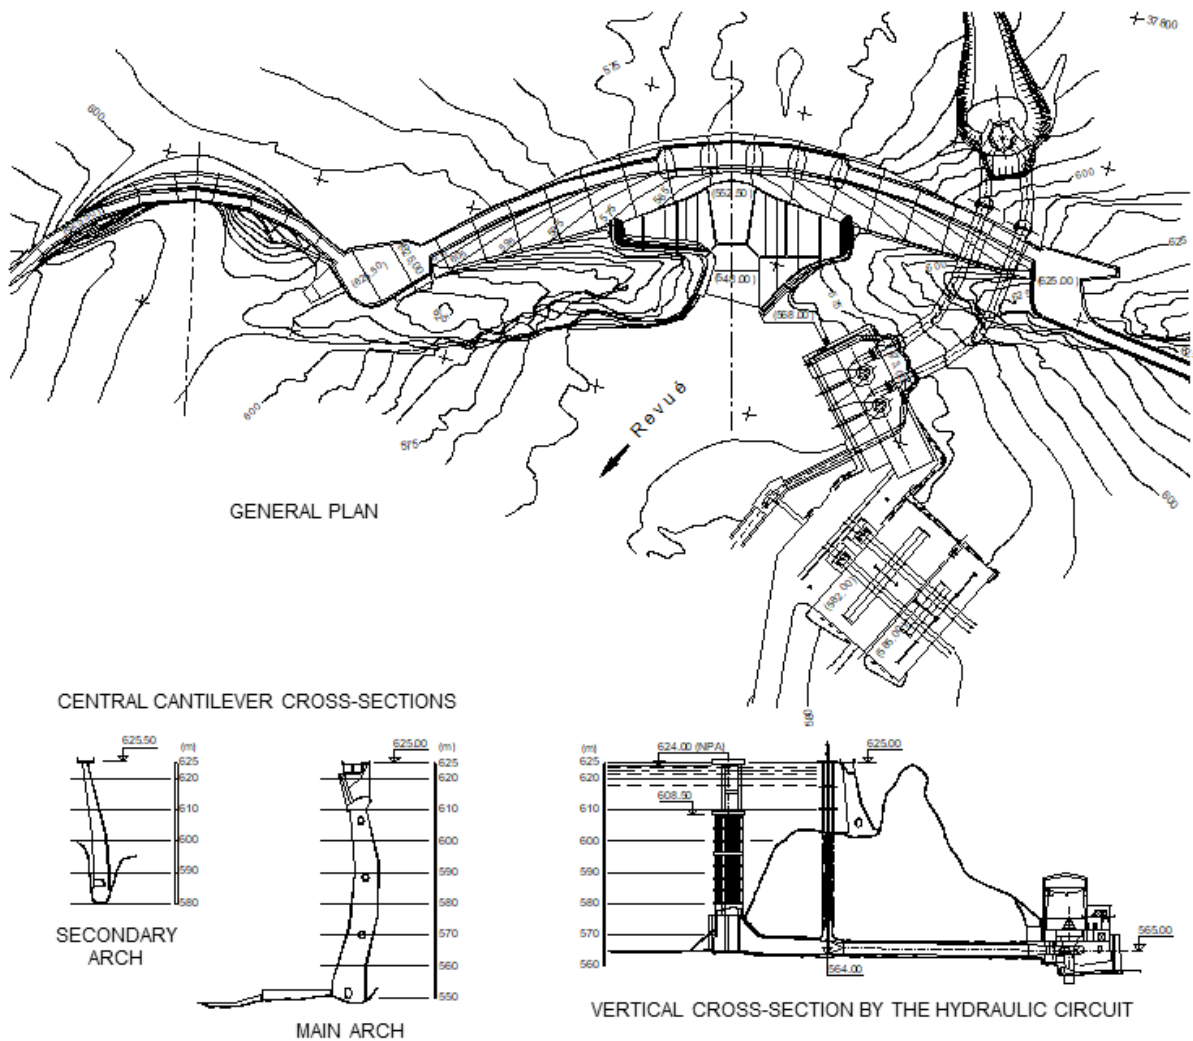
Chicamba dam. Plan and vertical cross-sections
